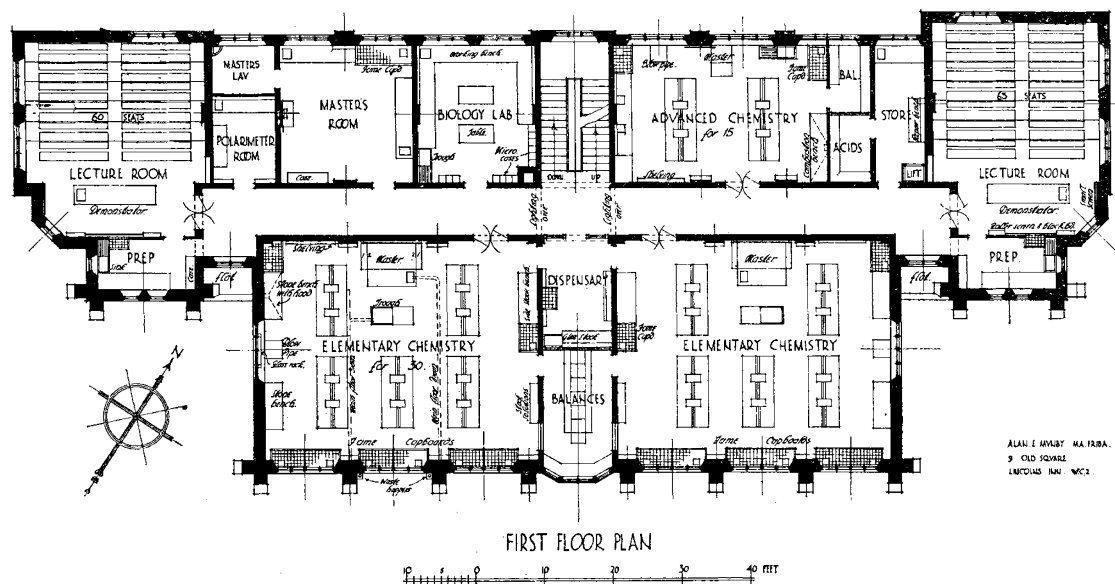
Plan of first floor of new Science School, Clifton College.
